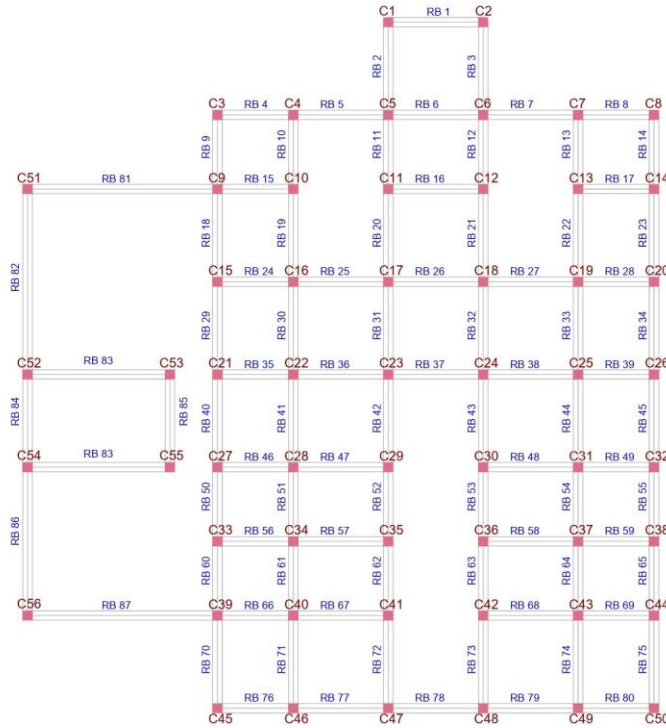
Layout Plan Kampung Parit Lapis Bangas Mosque.
